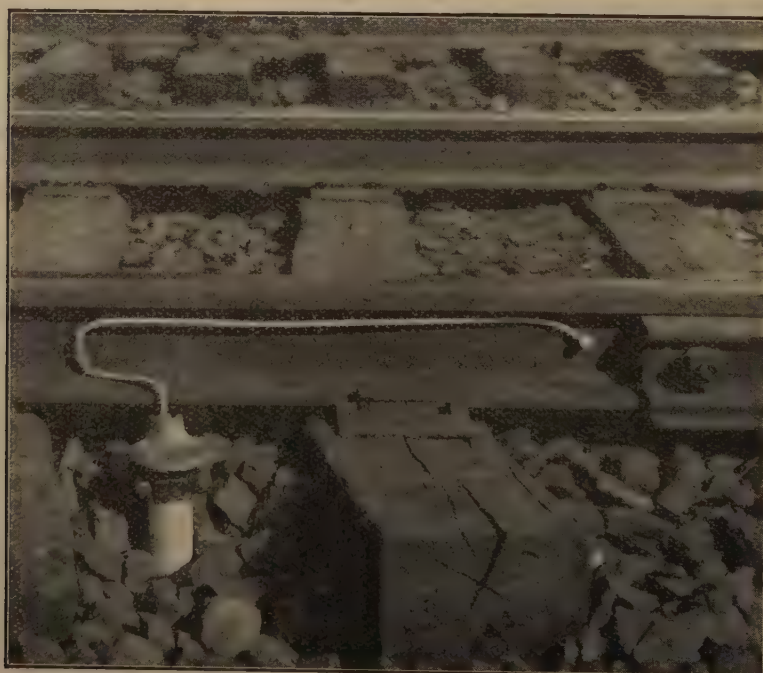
Underground cable and rail connection joined in head of improved "bootleg".
